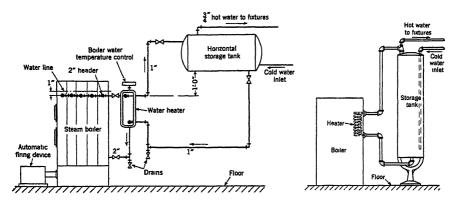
Indirect Water Heater Mounted on Side of Boiler
